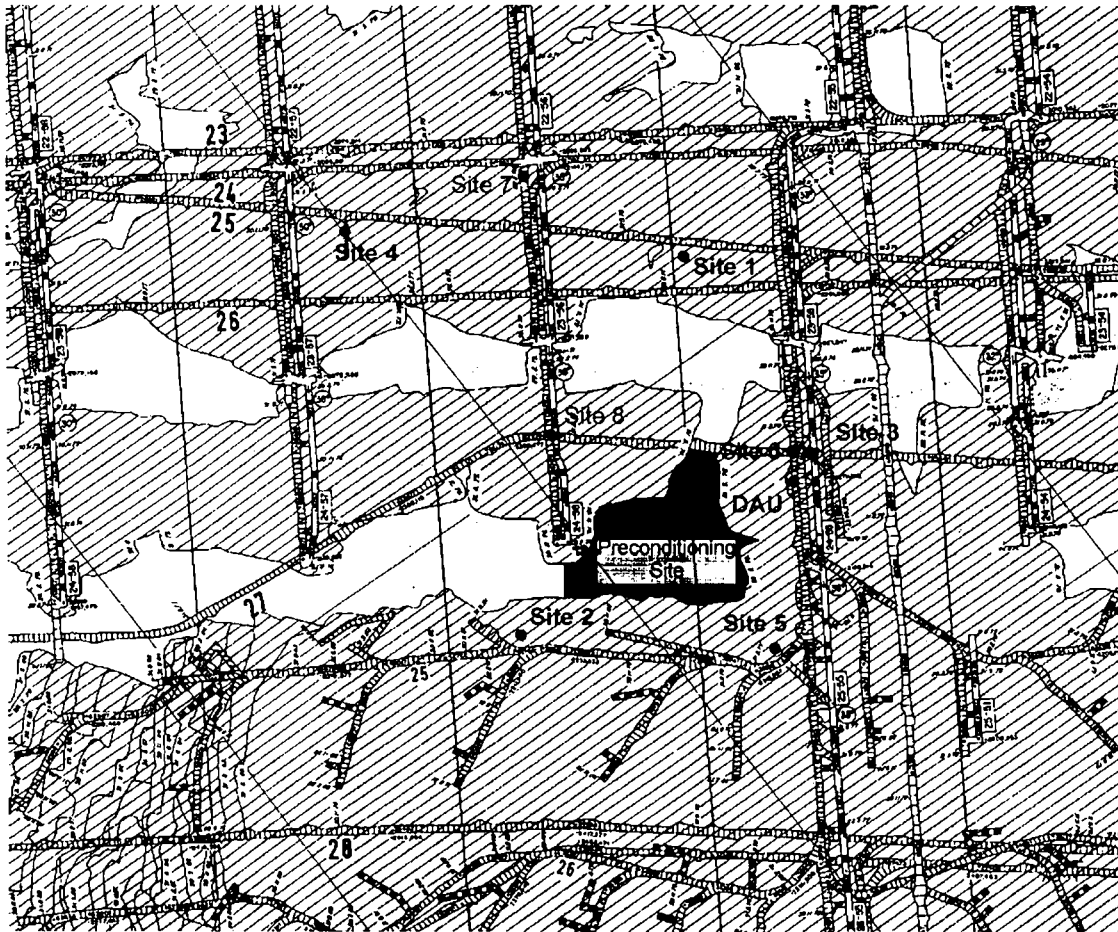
Plan of the preconditioning site on Libanon Gold Mine.
